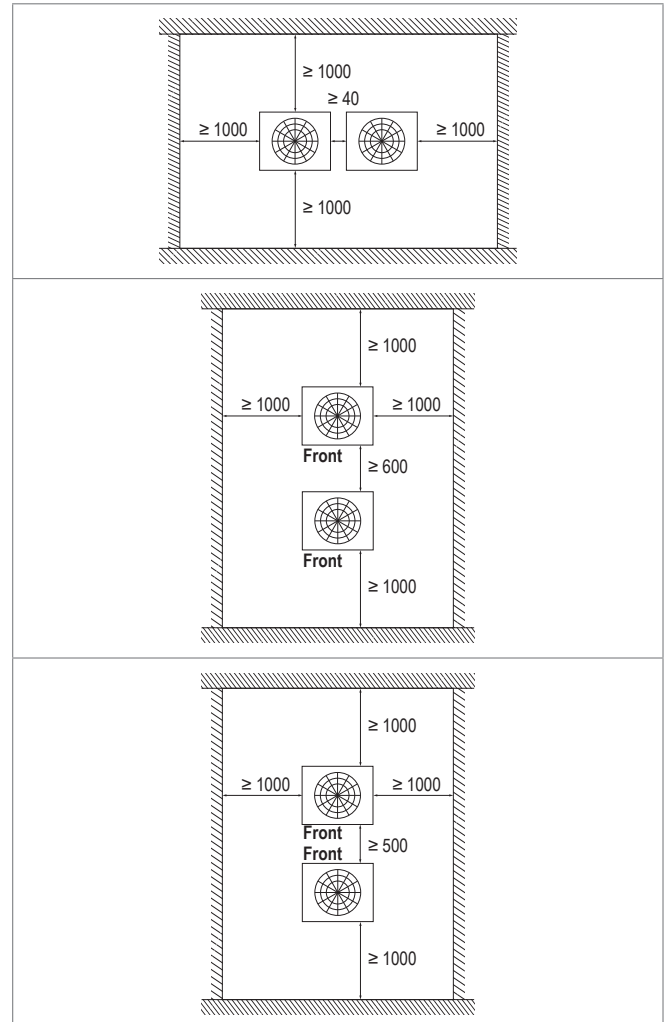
Minimum distances for the heat pump Q (dimensions in mm)
